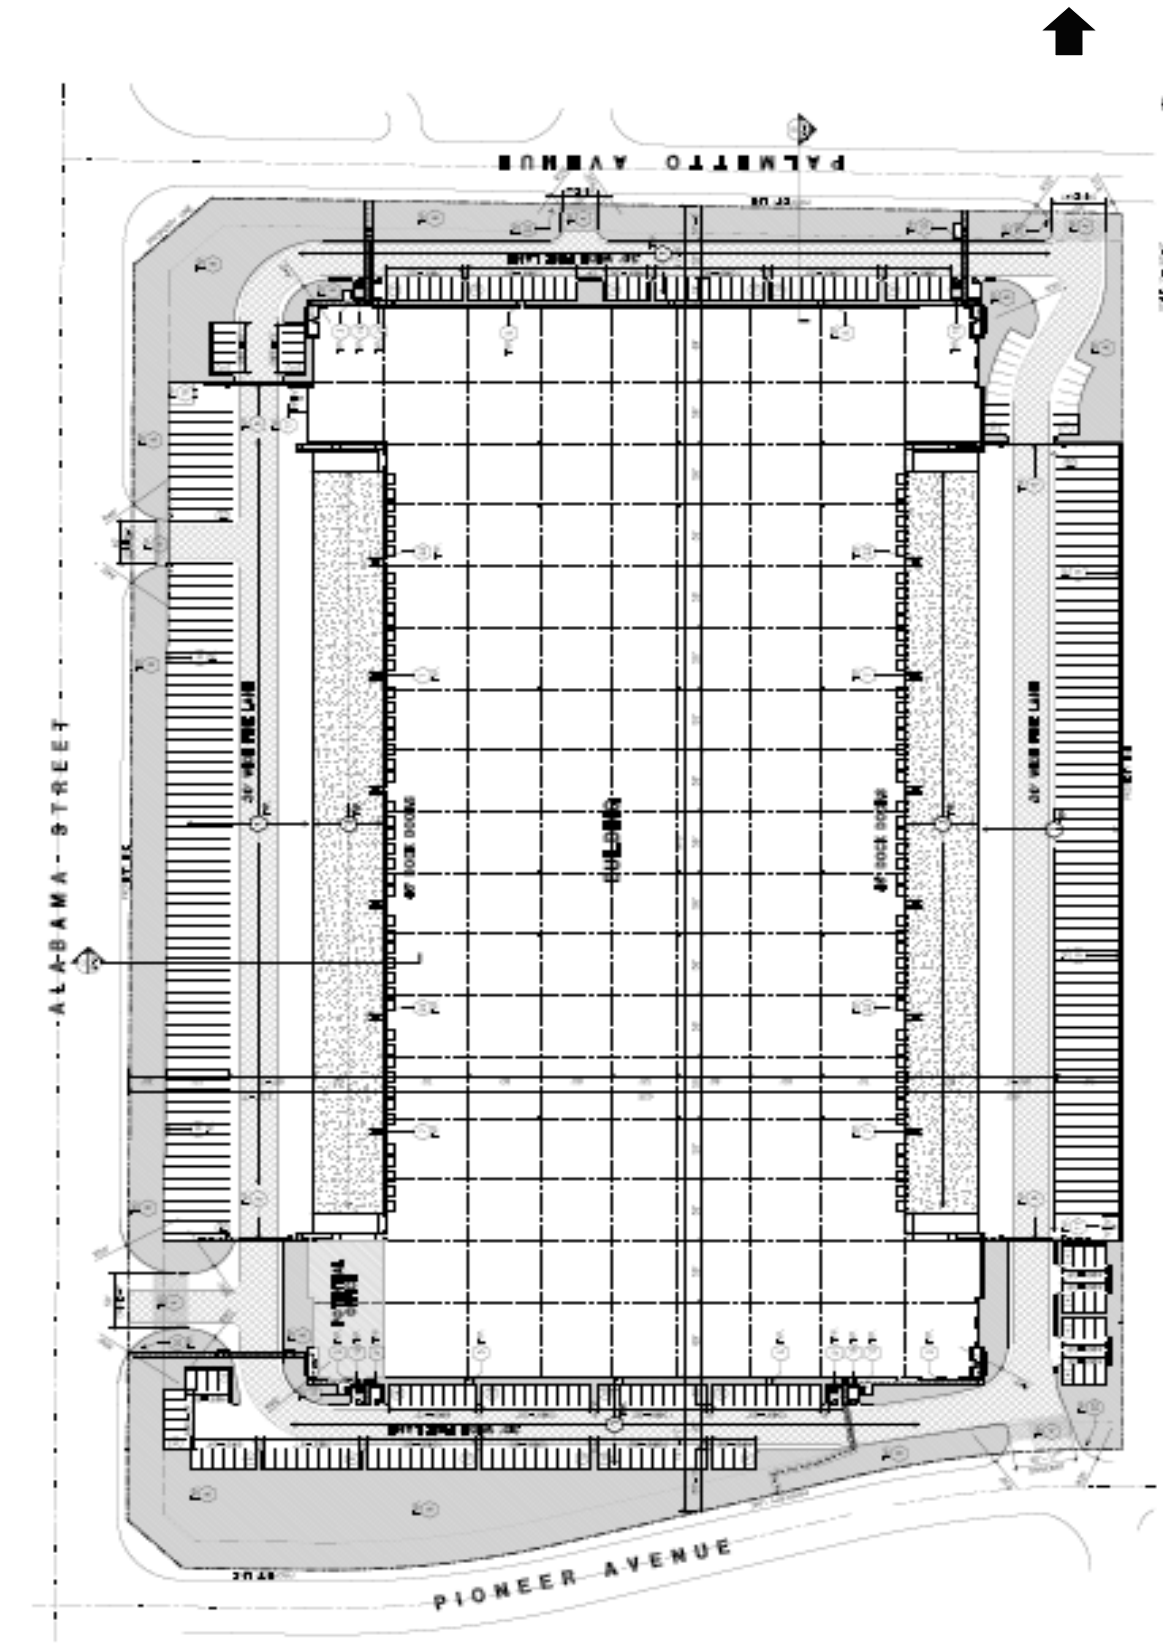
CONCEPTUAL LANDSCAPE PLAN
